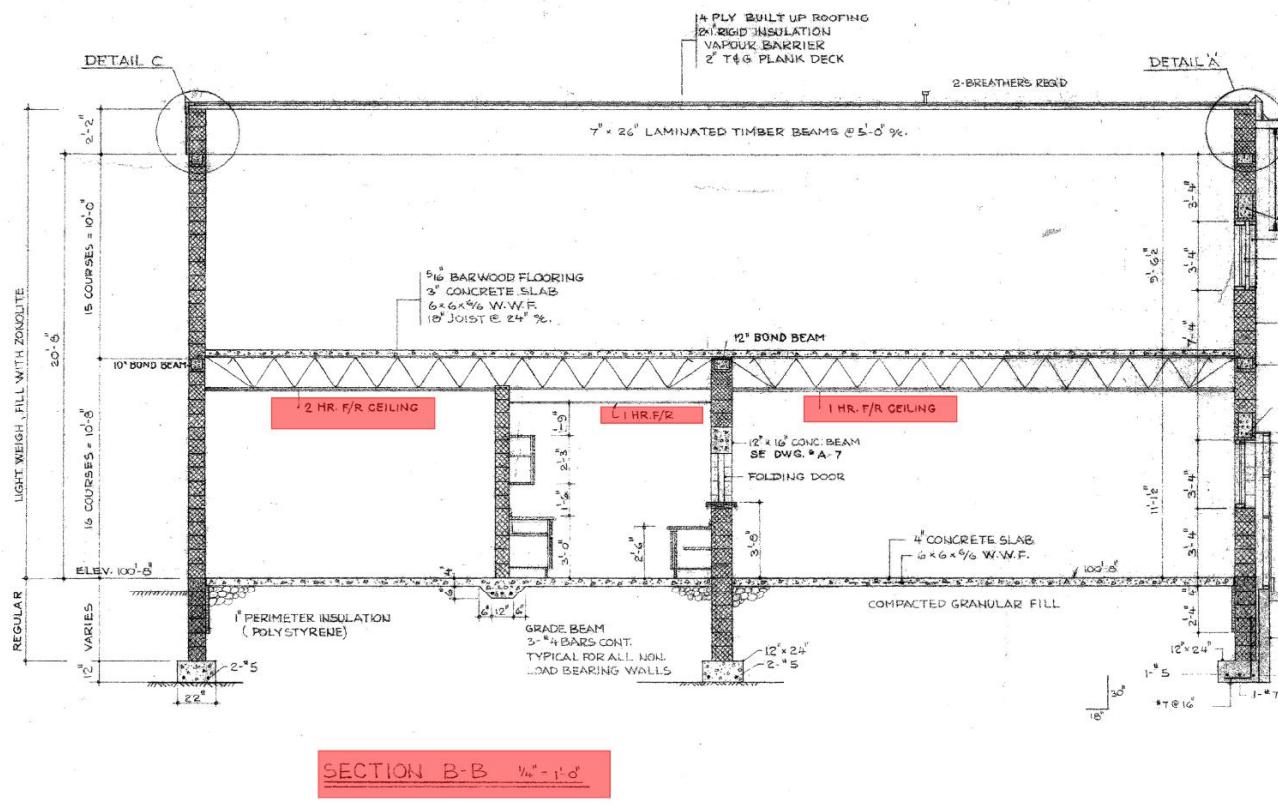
B: Cross-section from original drawings showing 1 hour rated 2nd Floor assembly
